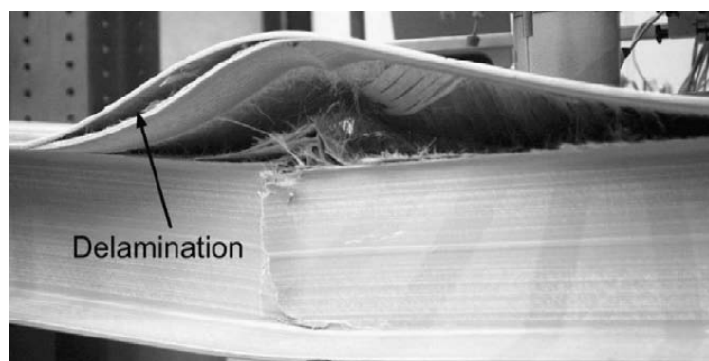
Delamination in the face layer of FRP bridge deck (Bai et al., 2009)
